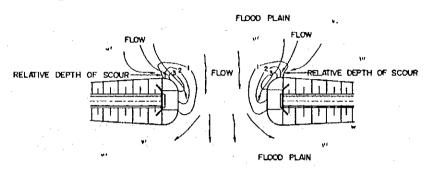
Flood Flow and Scouring at Bridge Opening
